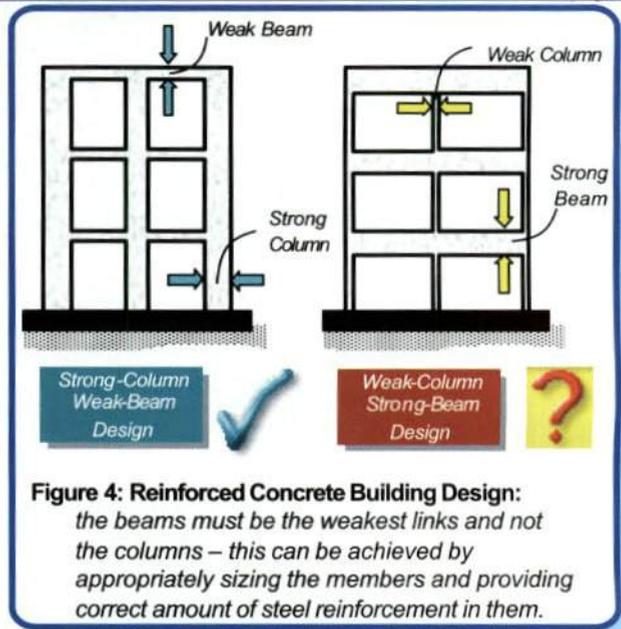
Reinforced Concrete Building Design: the beams must be the weakest links and not the columns – this can be achieved by appropriately sizing the members and providing correct amount of steel reinforcement in them.
